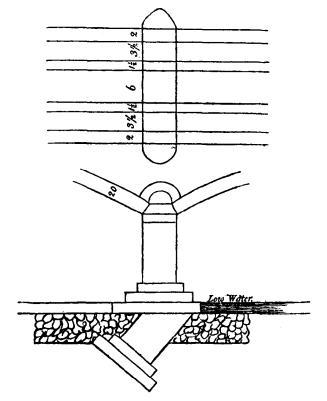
Sketch of Dumbarton Bridge failure (Smeaton: Reports 1, p. 339)
